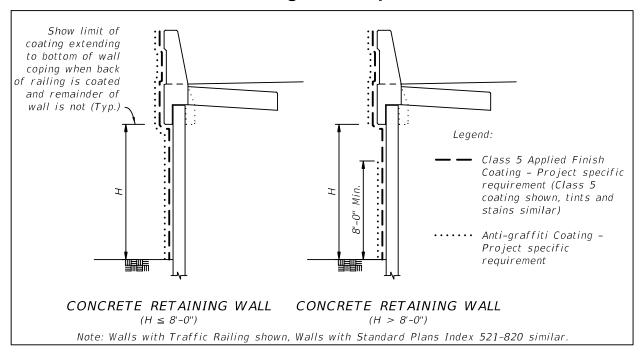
Example Surface Finish Depictions on Retaining Walls with Traffic Railings or Parapets
